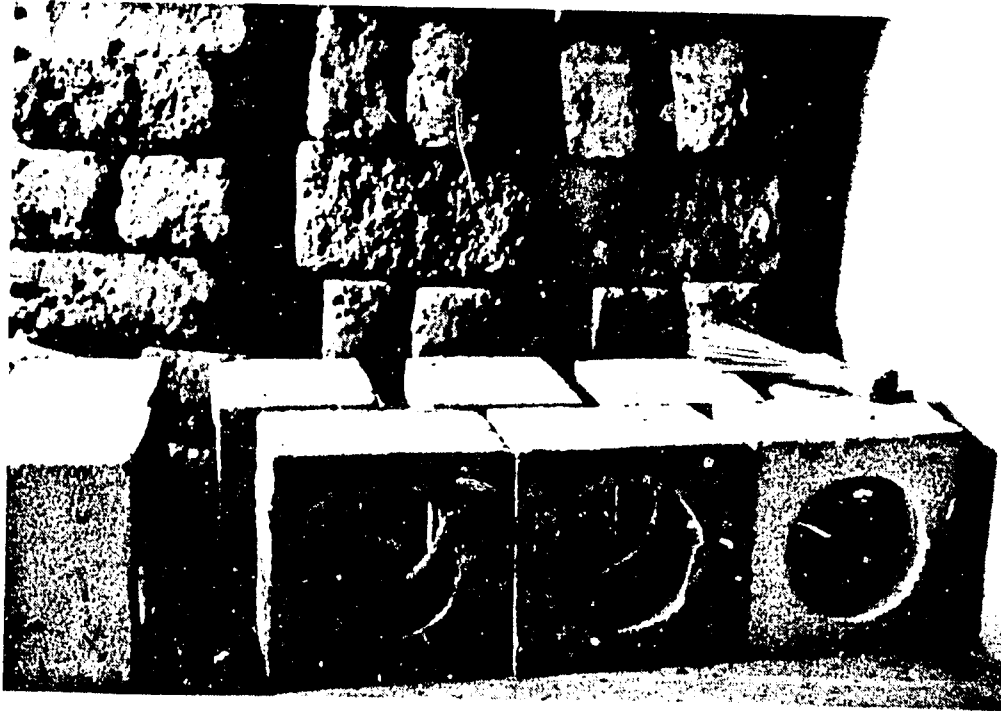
Village-constructed chimney blocks for a ventilated improved pit (VIP) latrine.
